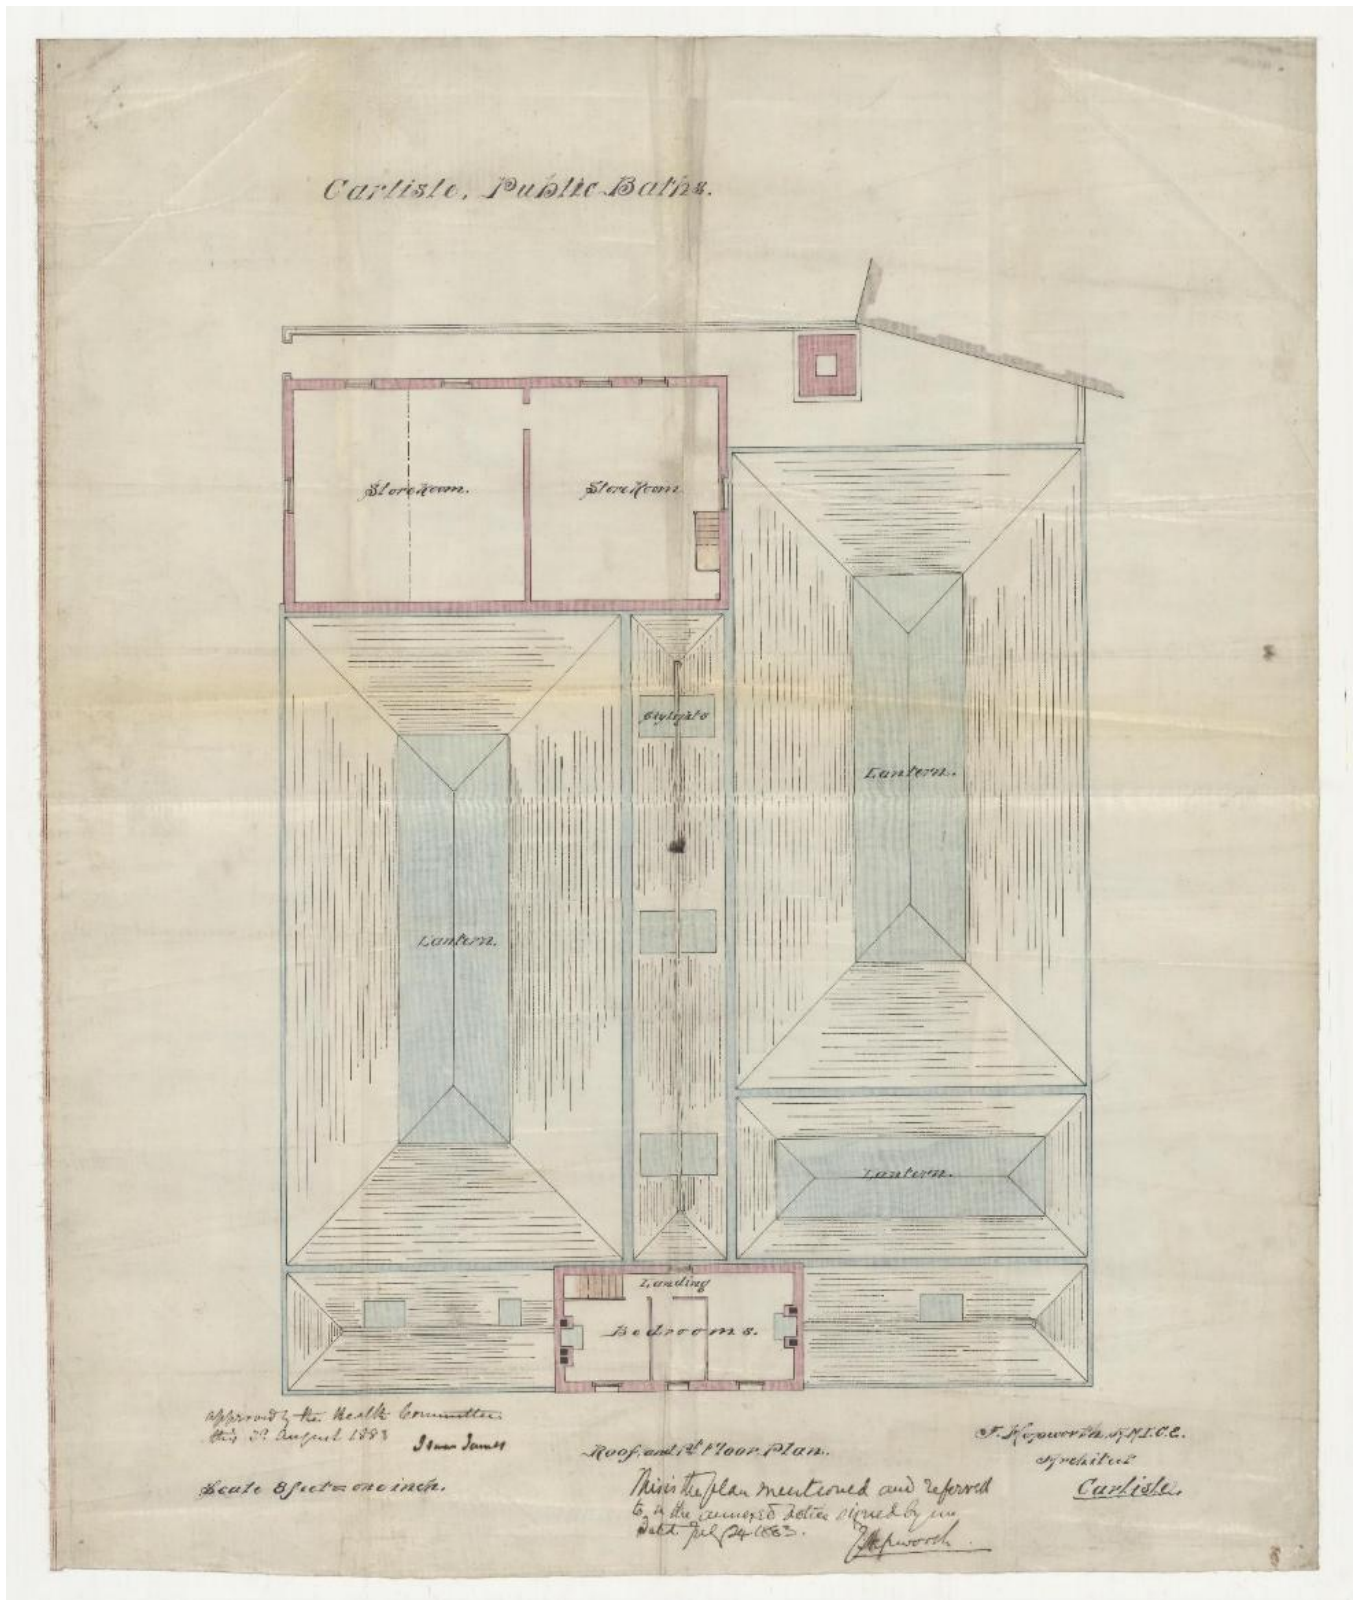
Above: Public Baths First Floor & Roof Plan 1883 (Cumbria Archives)
